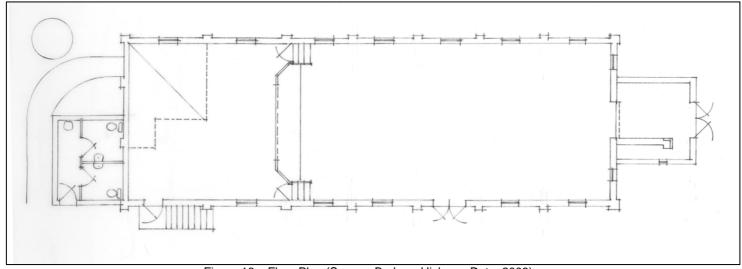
Floor Plan (Source: Barbara Hickson, Date: 2009)
